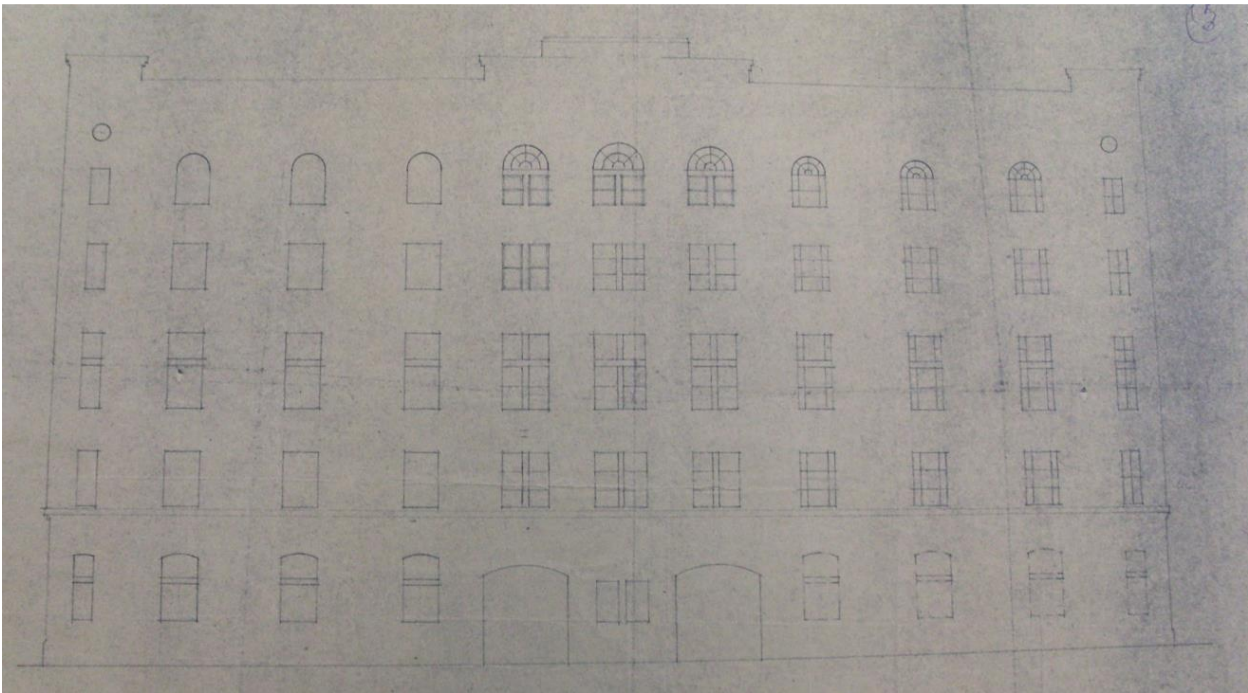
Elevation drawings showing windows of Irving Street Brewery buildings: South façade of buildings 22 and 23 by the Department of Building Materials, Drawing No. M24708 dated 28-04-50
